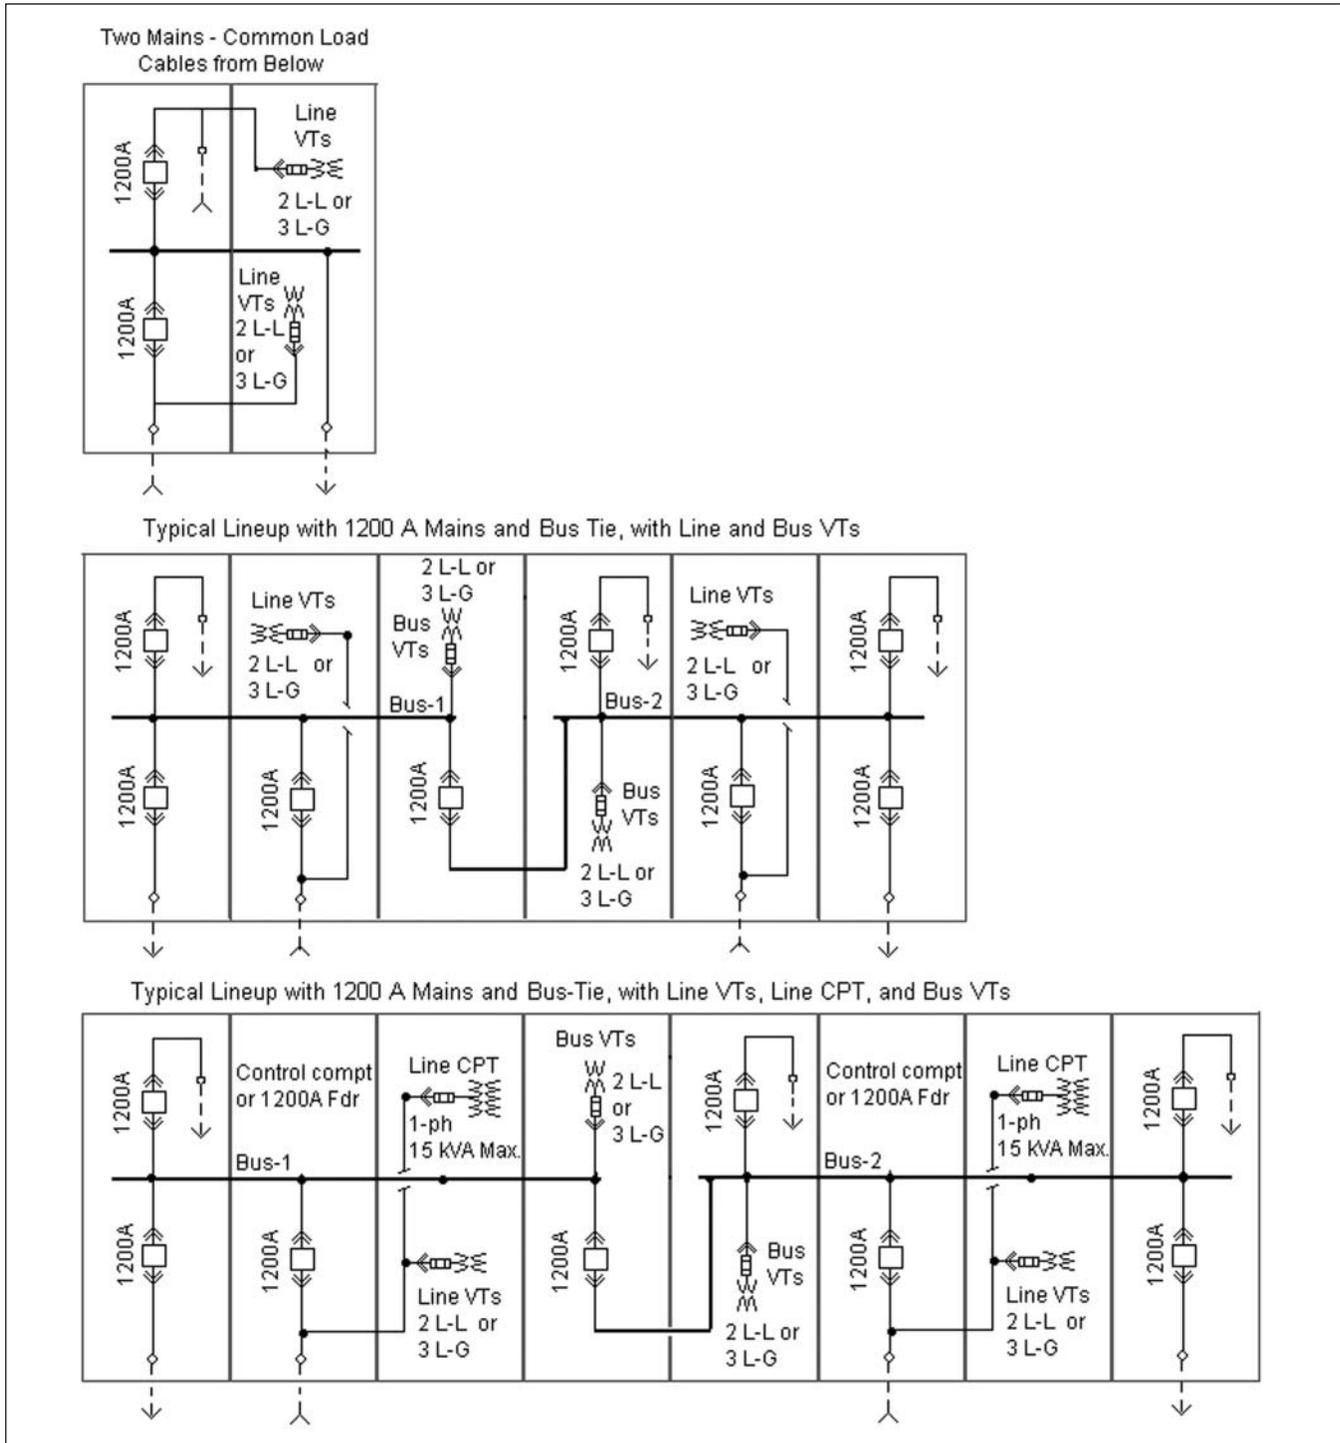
Typical Arc-Resistant Switchgear Application Layouts—5 and 15 kV
